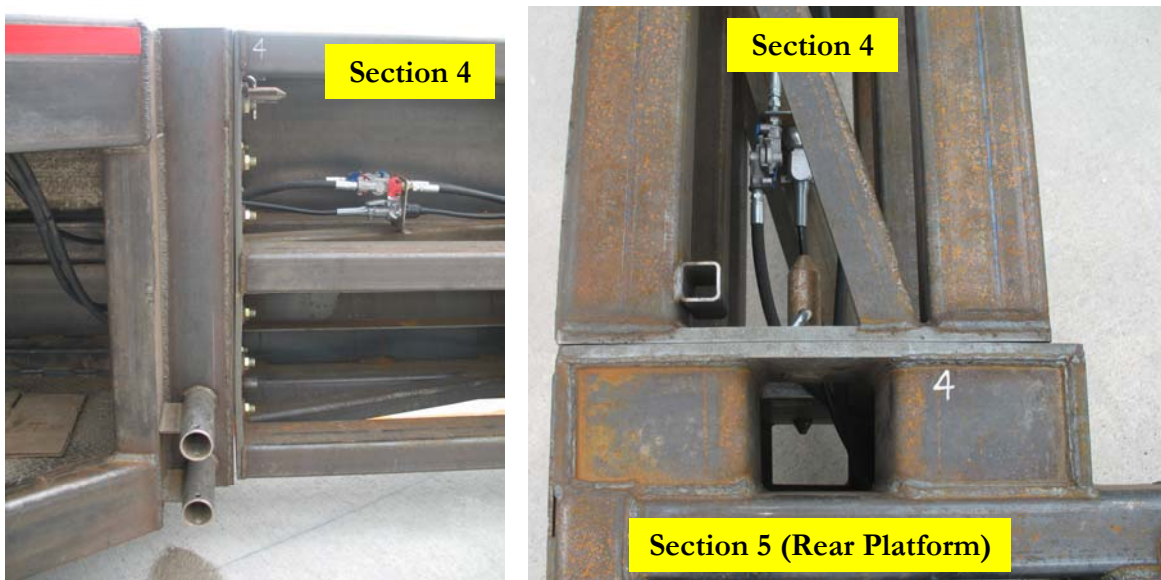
Post Impact Condition of Joint 4 (Connecting Sections 4 and 5)
